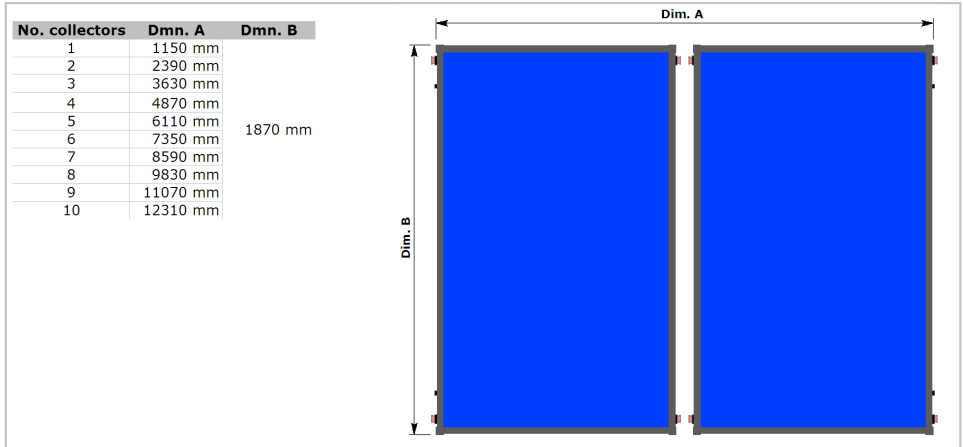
Space requirement Dimplex SOLC220 on roof installation
